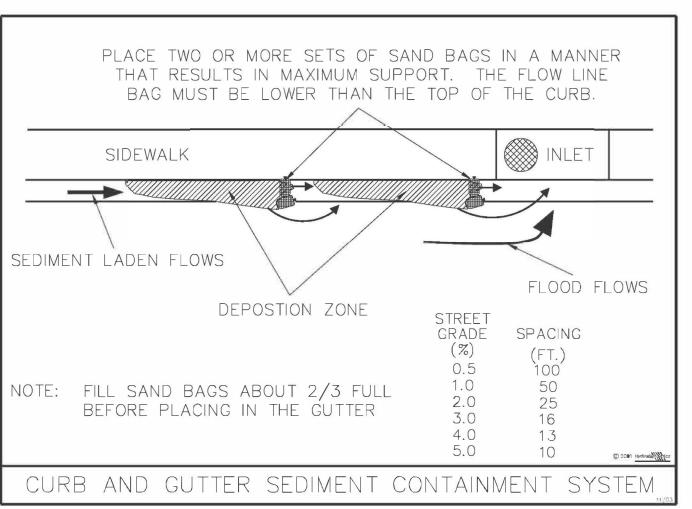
Illustration of a Curb and Gutter Sediment Containment System
